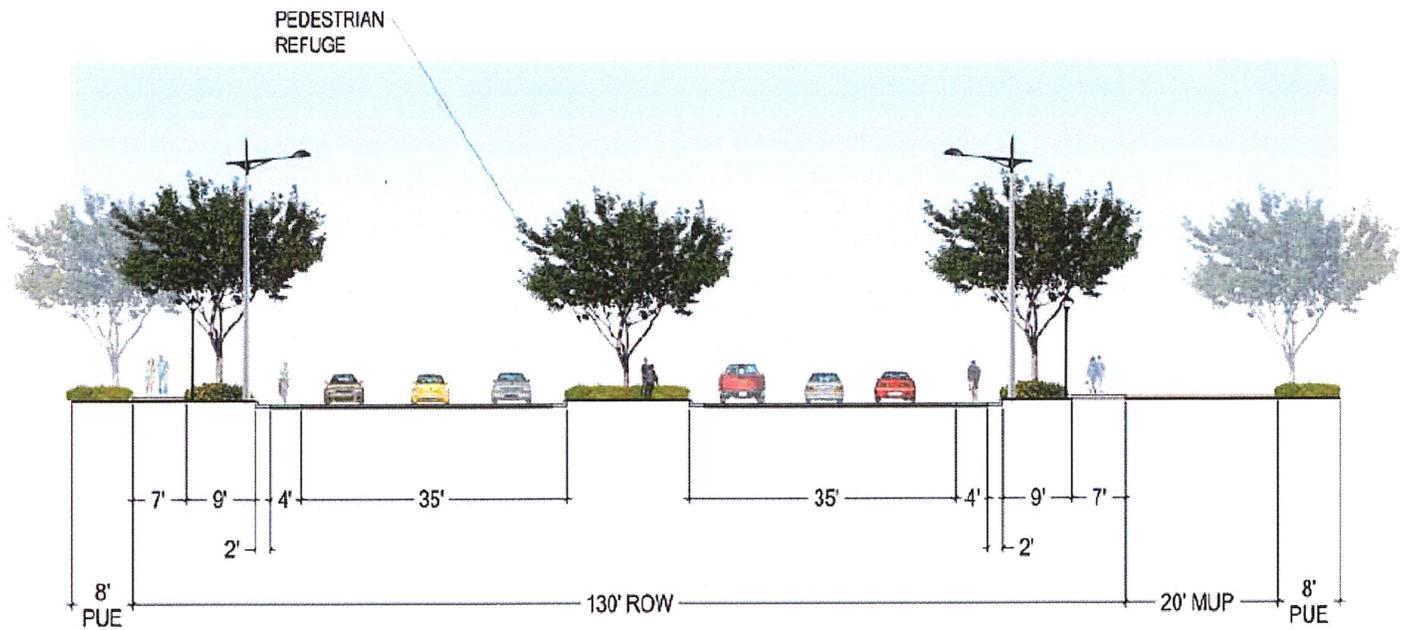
Roosevelt Street – Avondale Boulevard to 117th Avenue Cross-section 3
